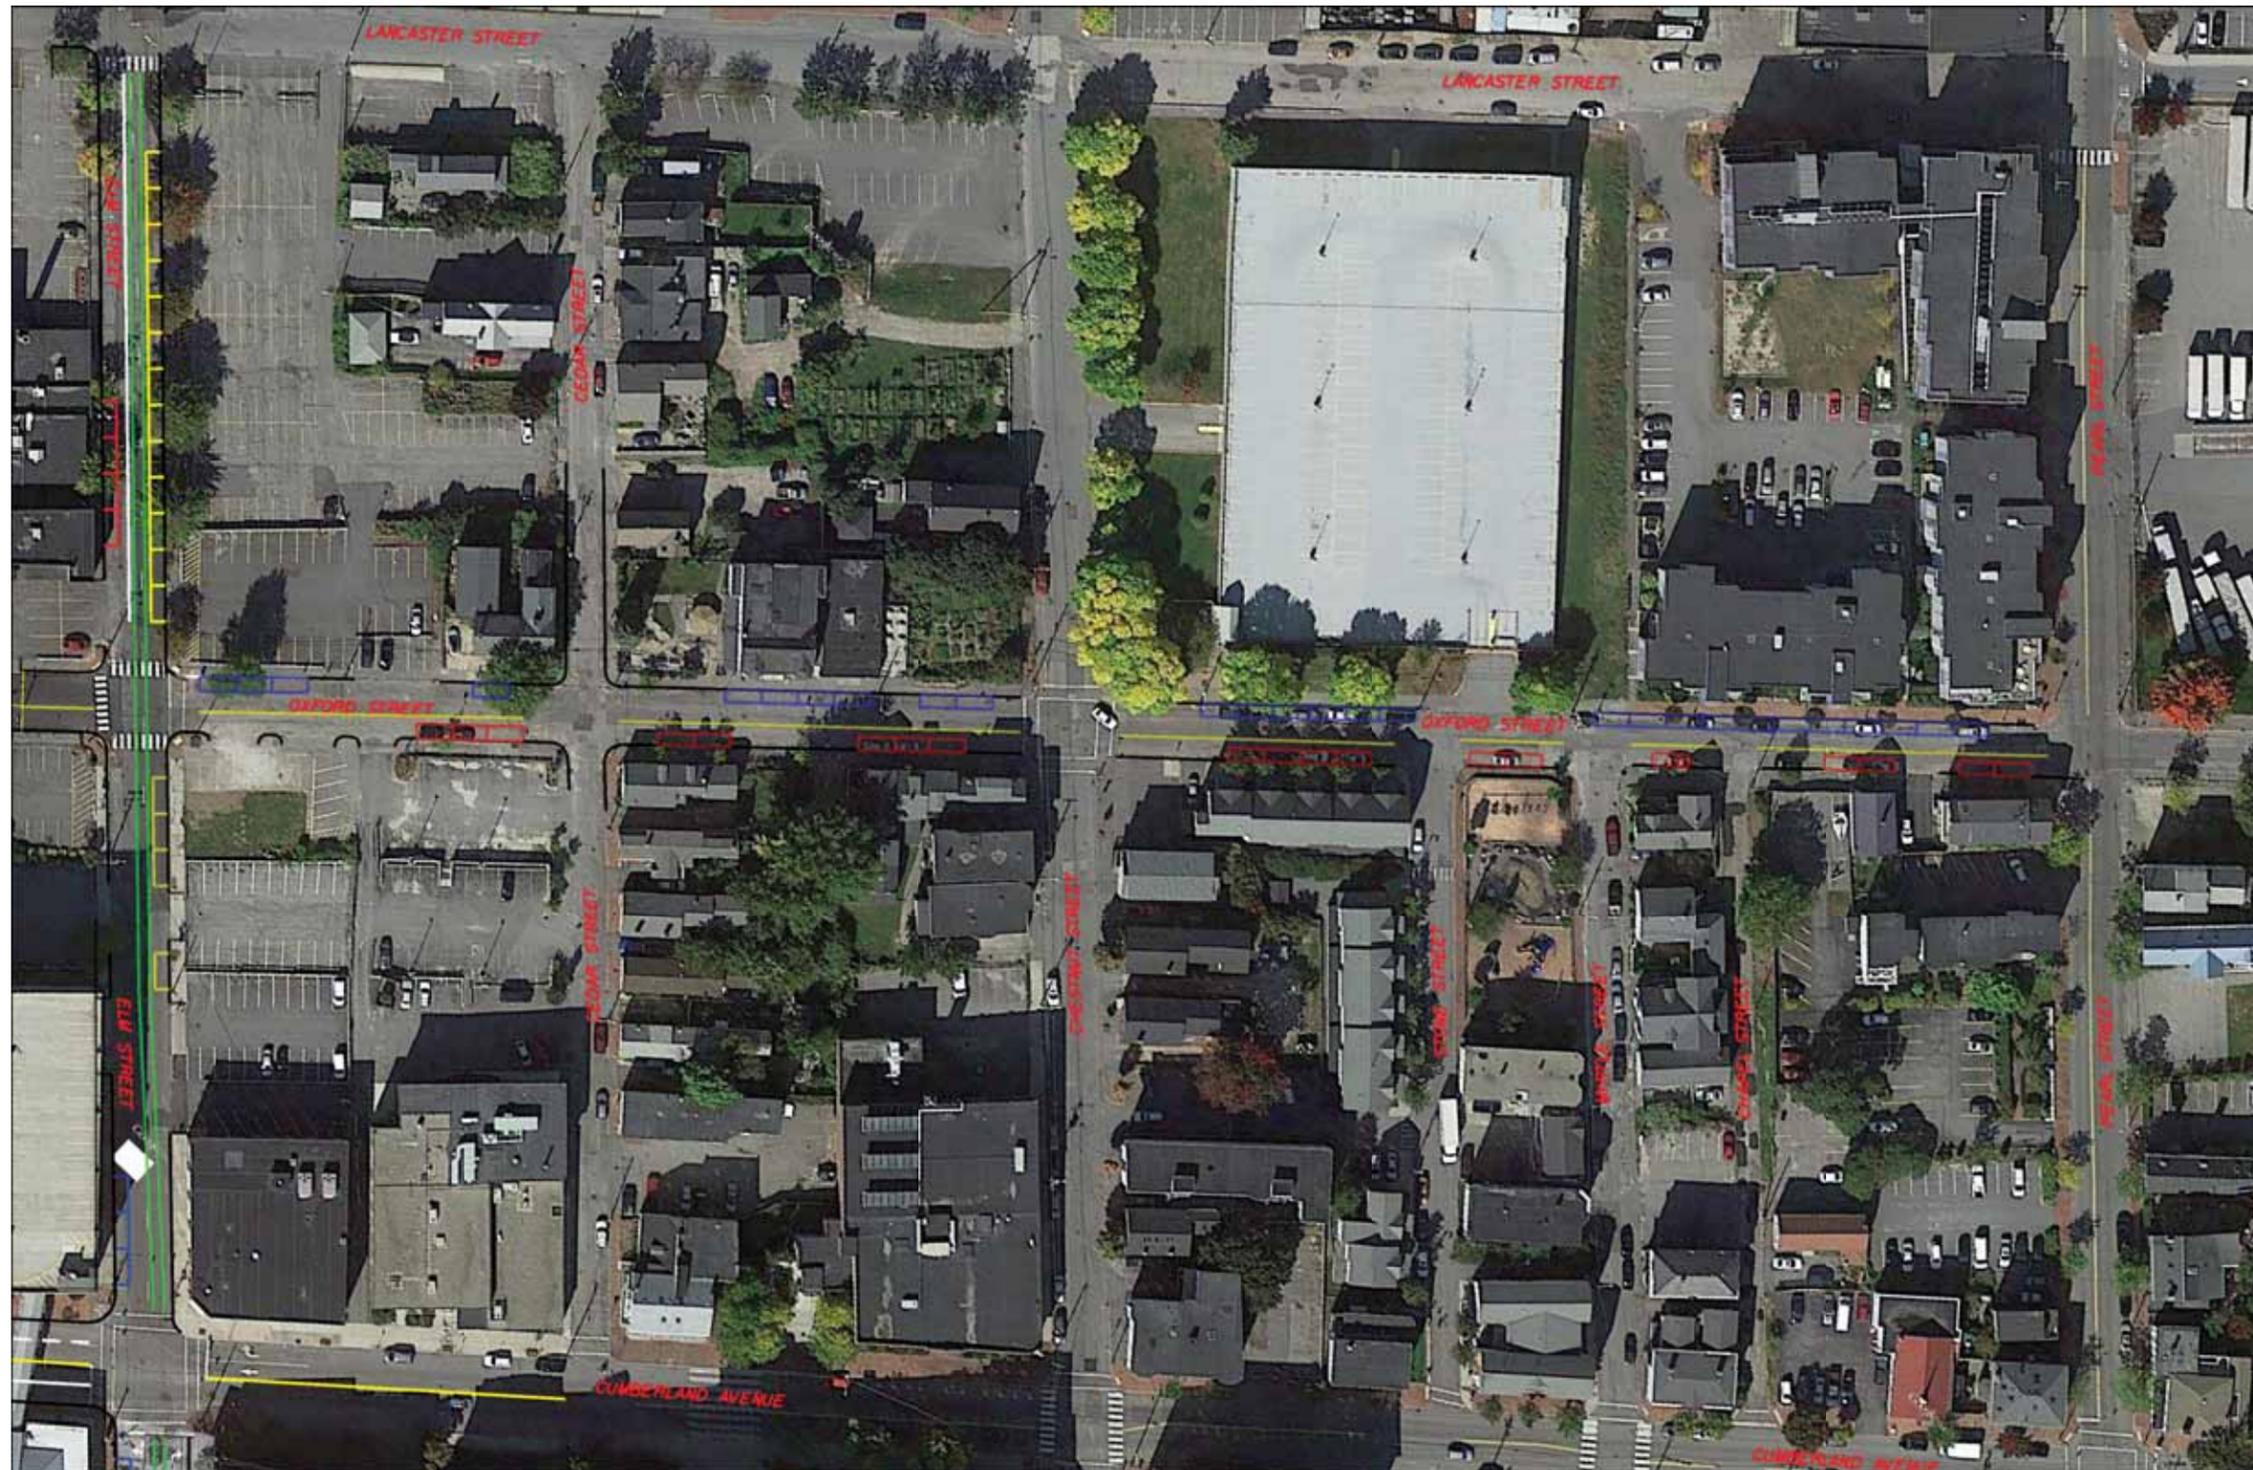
Oxford Street Two-way Plan 1 of 2: Phase1, Elm Street to Alder Street
